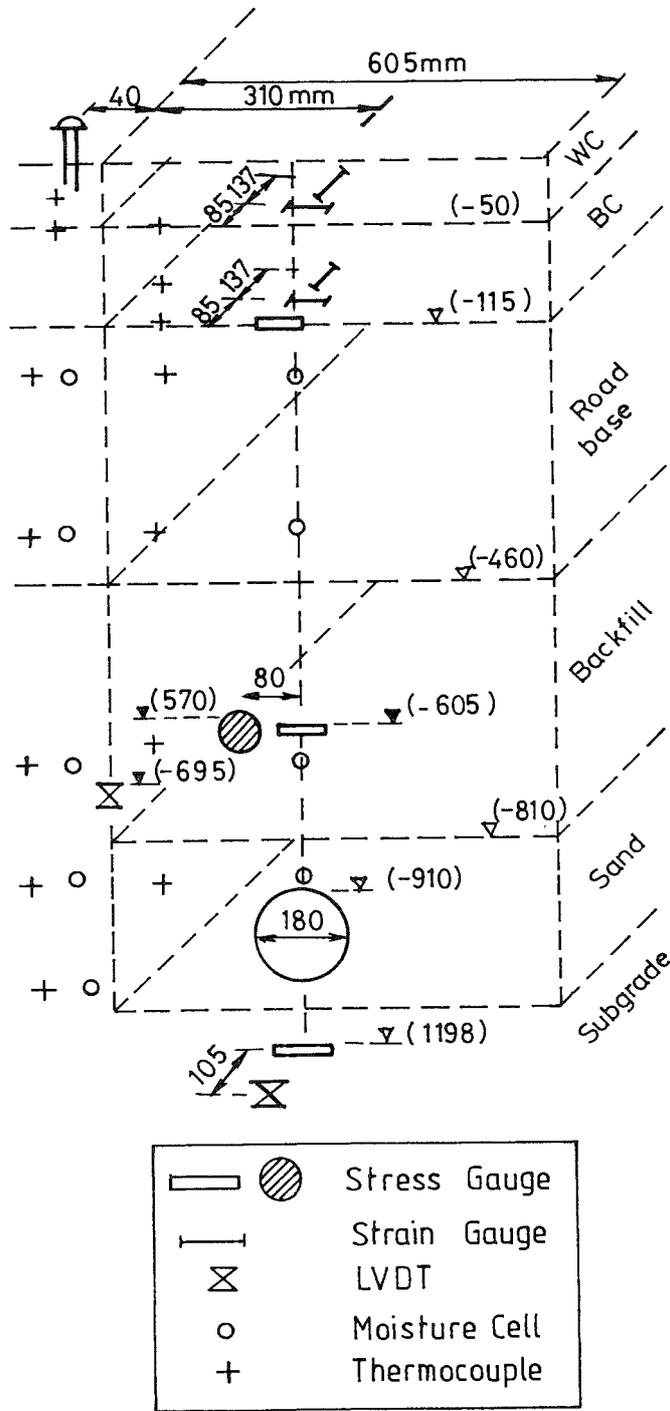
Cross-section of the Test Road at QUB site showing instrumentation.
